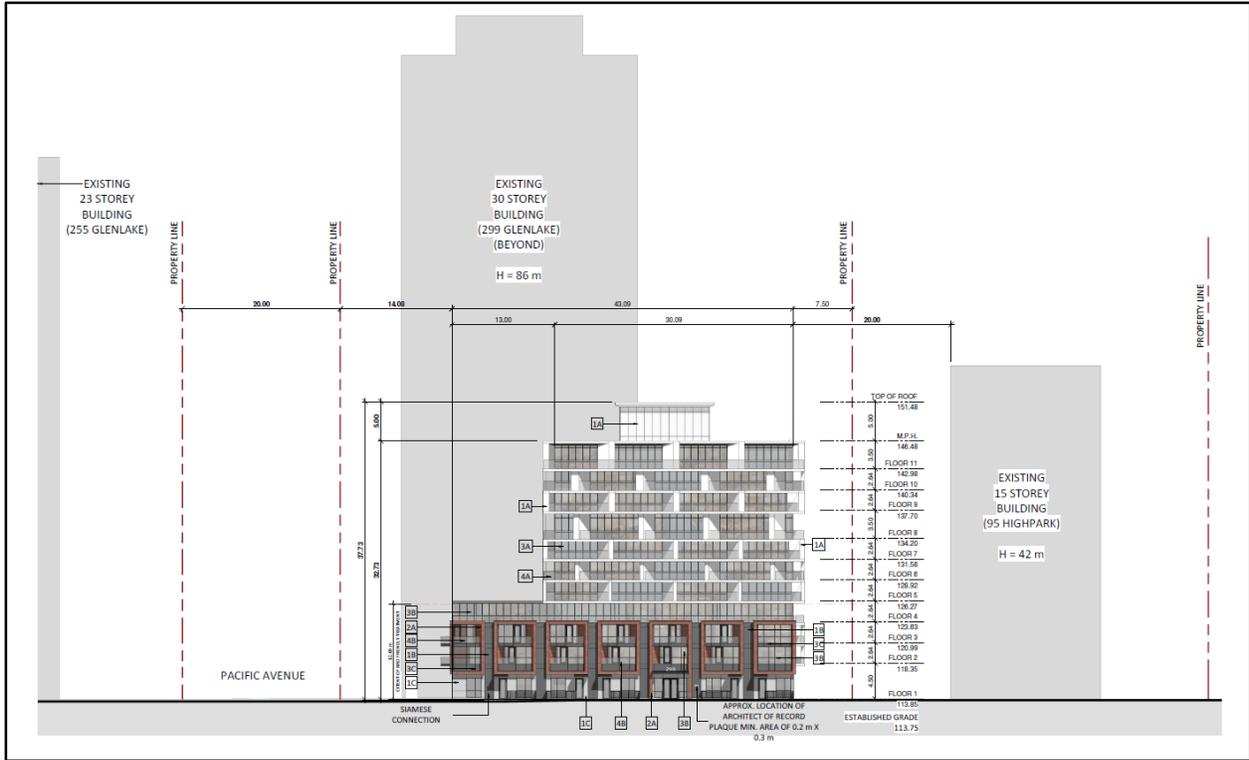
North Elevation of 299 Glenlake Avenue proposal (Turner Fleischer Architects, January 25, 2018)
